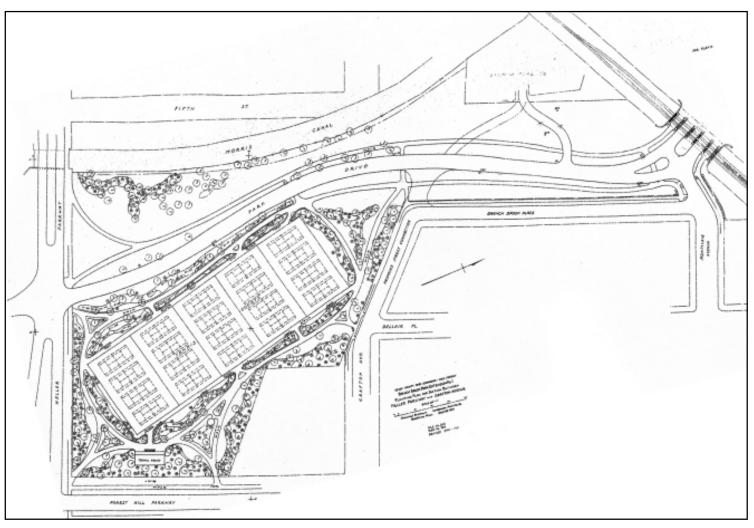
Planting Plan from Heller Parkway to Grafton Avenue, Plan #2121-734, sheet 1, September 1927. Source: ONHS.
